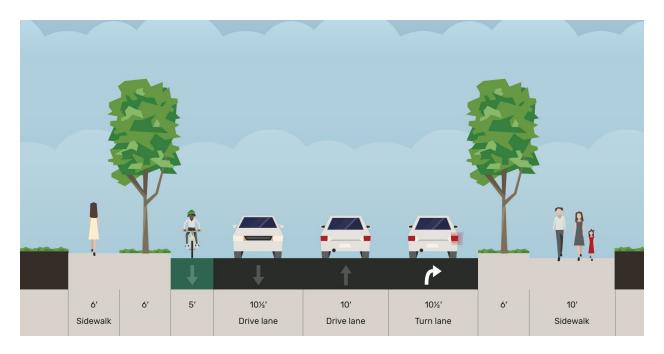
Option 4 - Master Plan Vision Cross Section with Climbing Lane
